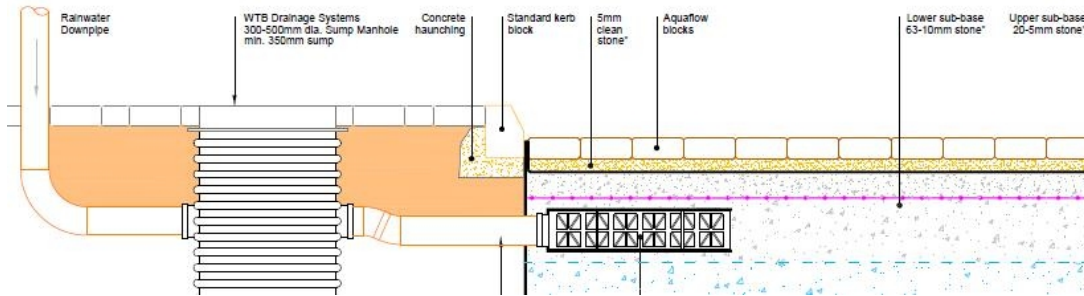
Typical Permeable Paving Detail (c: Roadstone)
